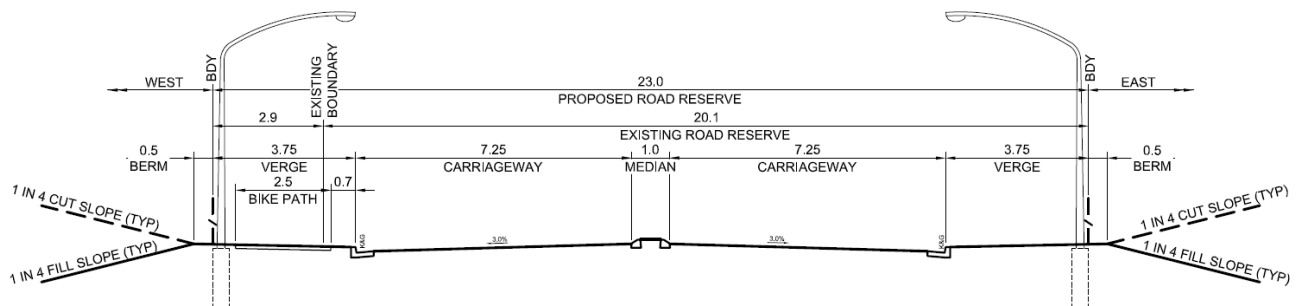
Old Wallgrove Road - Typical Section CH200-CH270
